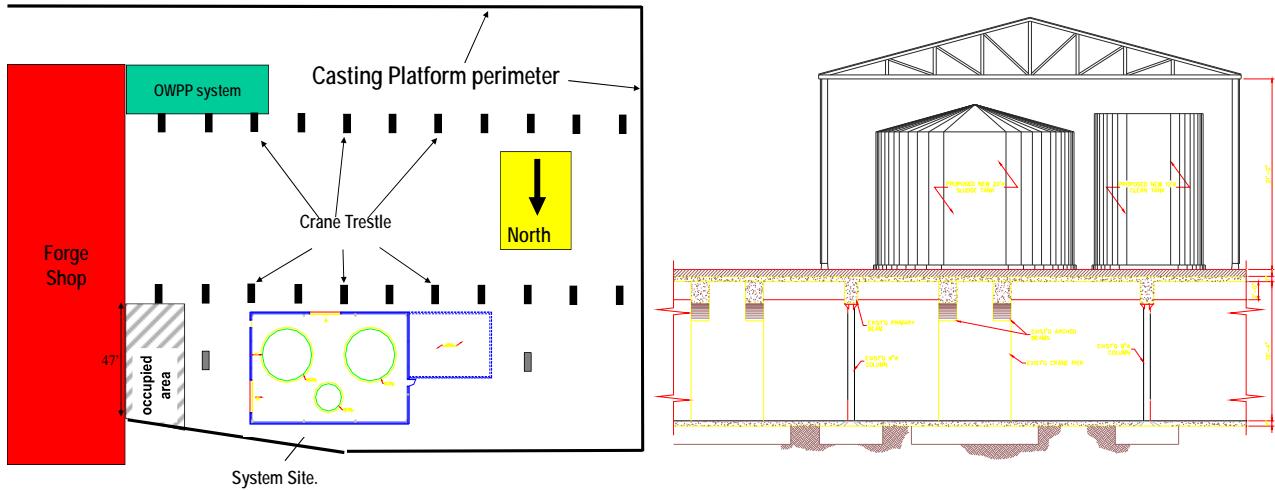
Plan view (left) and a vertical section (right) of the treatment plant.
